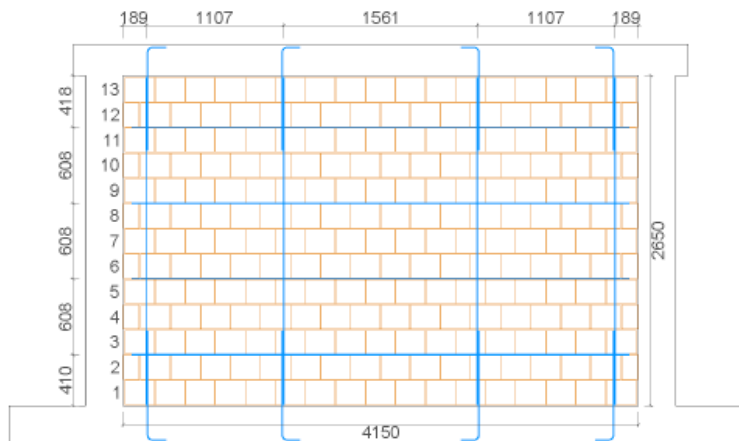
Reinforcement layout used for thick infills by Guidi et al. (2013). Adapted from Guidi et al. (2013).
